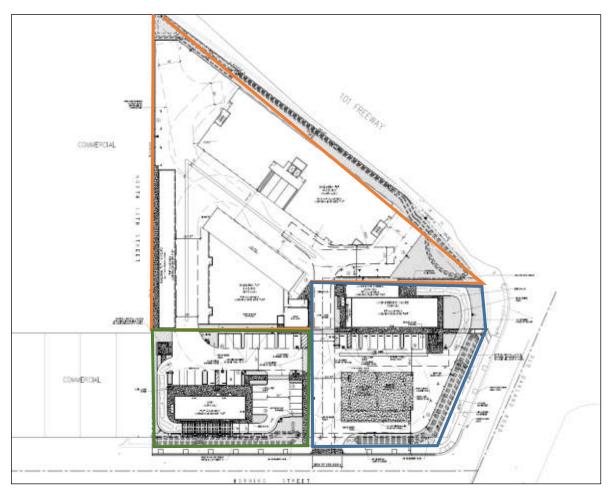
Site Plan, Orange Outline- Mini-storage use, Blue Outline – Gas Station, Convenience Store, Carwash Use, and Green Outline- Drive-Through Restaurant (larger plan set attached to Staff Report)
